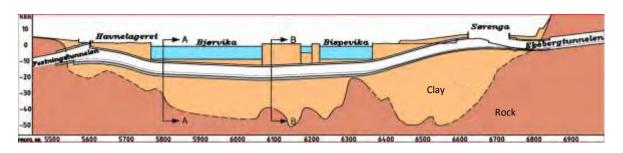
Longitudinal section of the immersed tunnel showing clay(leire) and bedrock(fjell).
